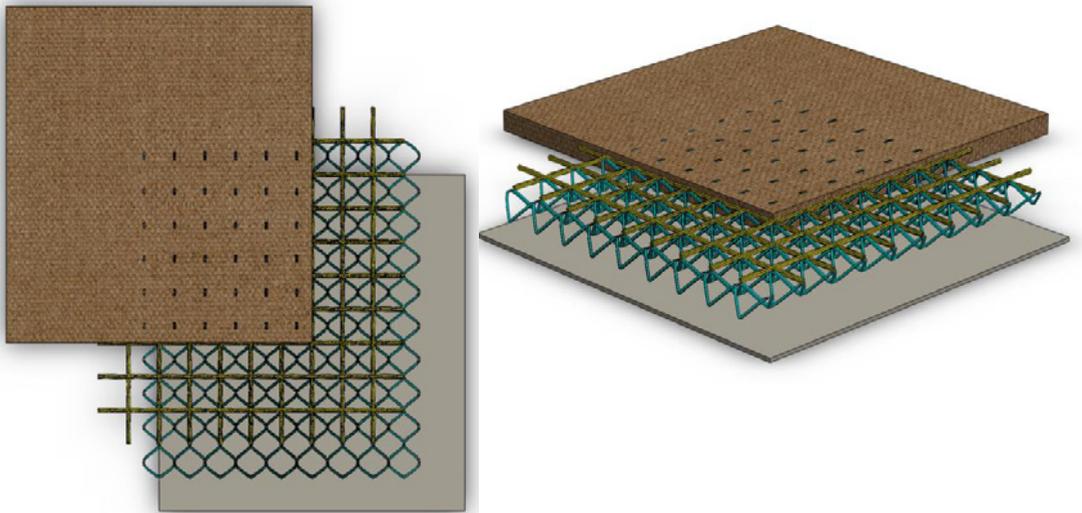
The propose composite steel plate shear walls with truss reinforcement.
